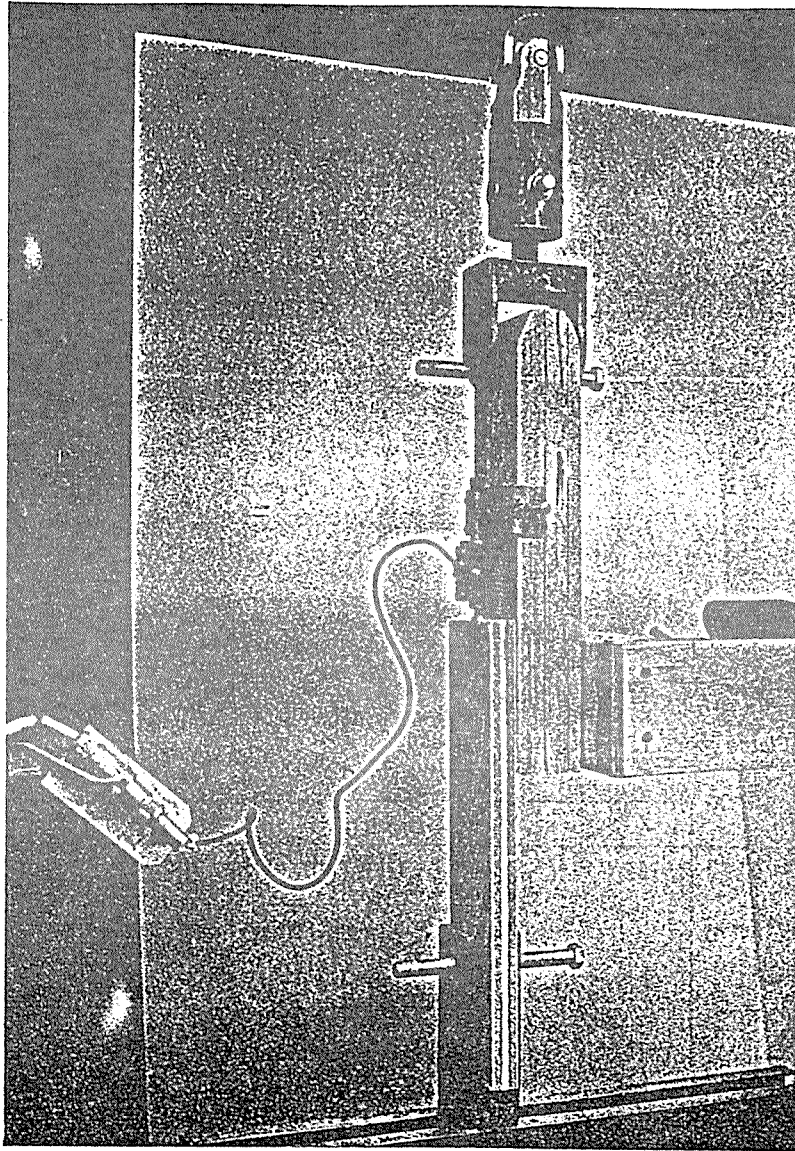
Laterally loading nailed or stapled joints. The plywood brace kept the specimen in a vertical plane while it was being loaded in tension.
